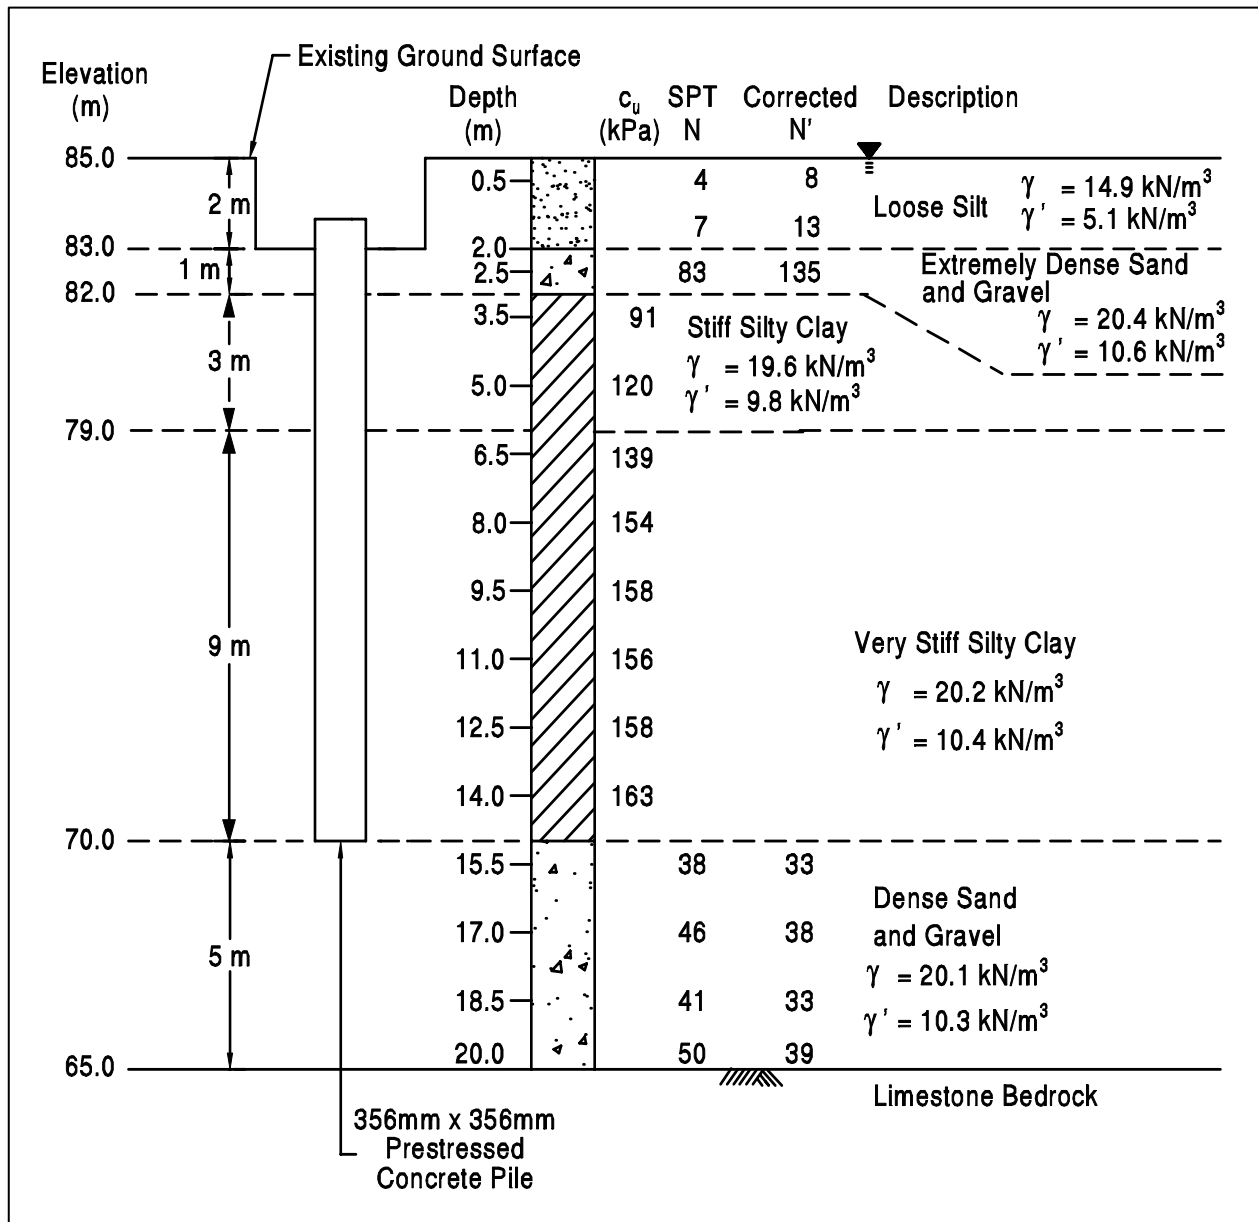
Interpreted Soil Profile from Soil Boring S-3 at Pier 3
